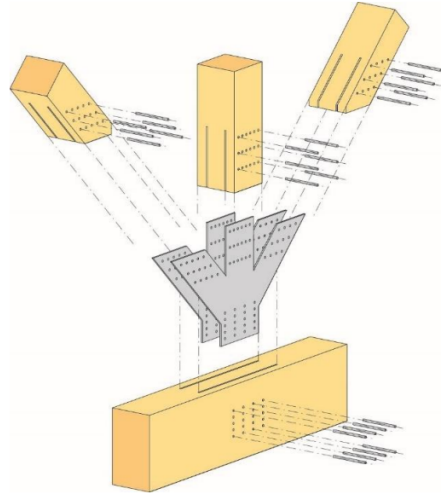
Example of a Slotted-in Steel timber connection [16]
